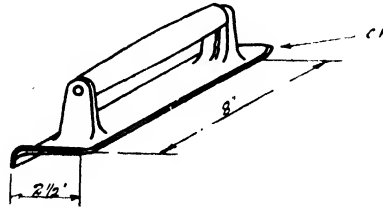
ROUNDING TOOL FOR FINISHING ARRISES OF JOINTS.
